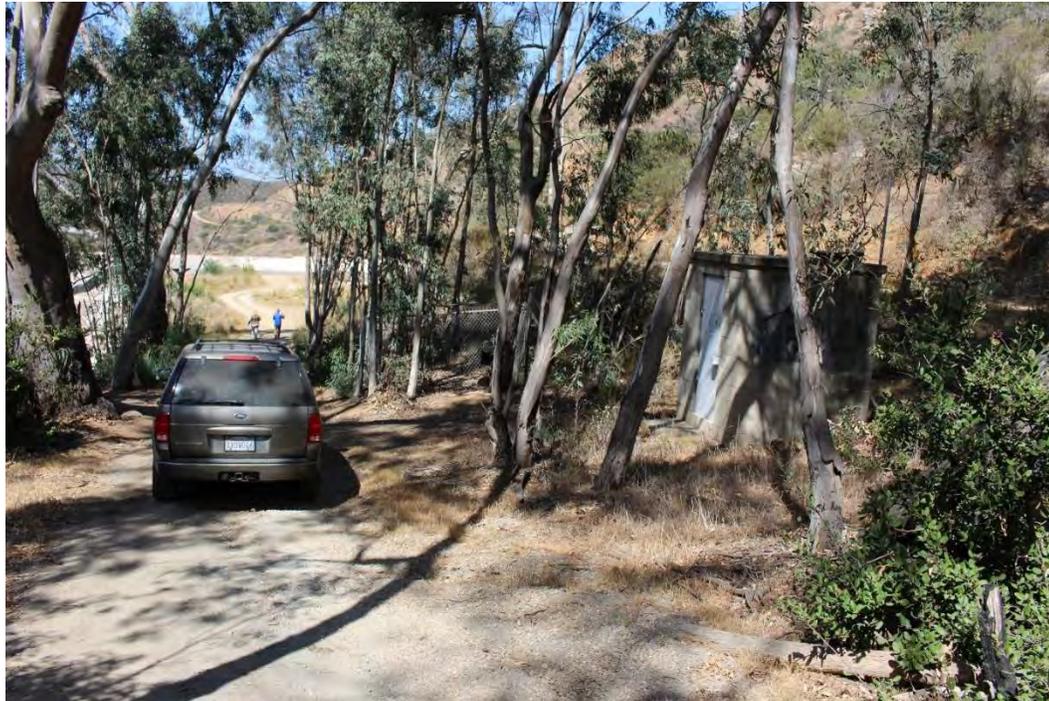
South and east elevations of utility shed, with spillway access road at left, looking west. June 11, 2018. (IMG 2360)
